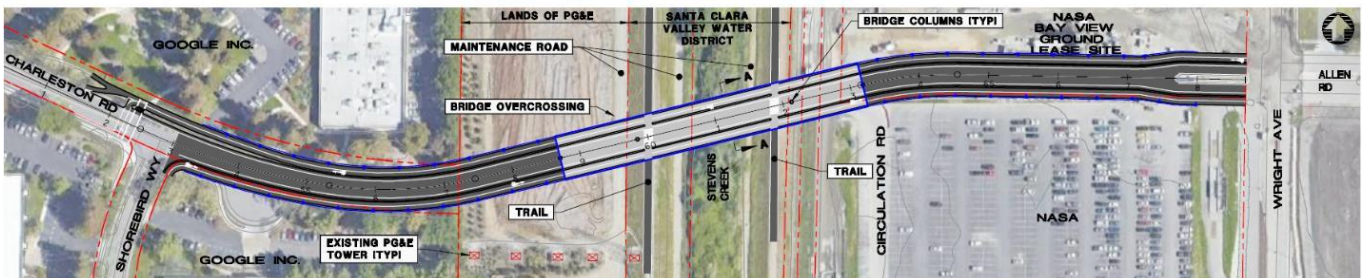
La Avenida Street at Stevens Creek at Bridge (Location 3)
